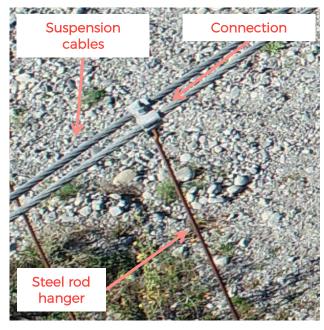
Typical steel rod hanger top connection to suspension cables
